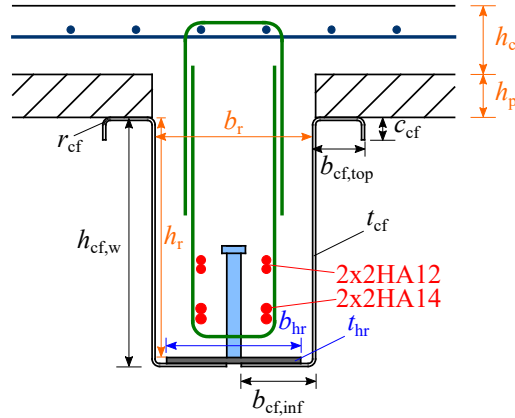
U-shaped steel-concrete composite cross-section studied
